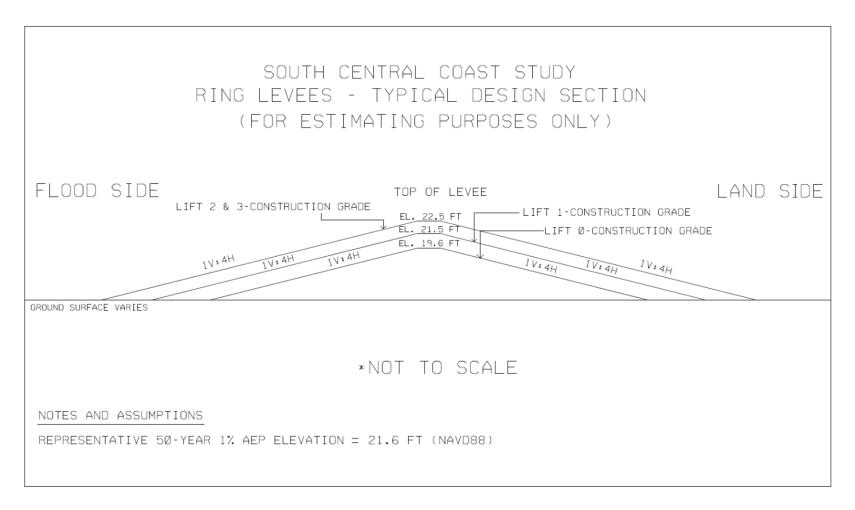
Typical Levee Section for Plan 1 – Ring Levees.
